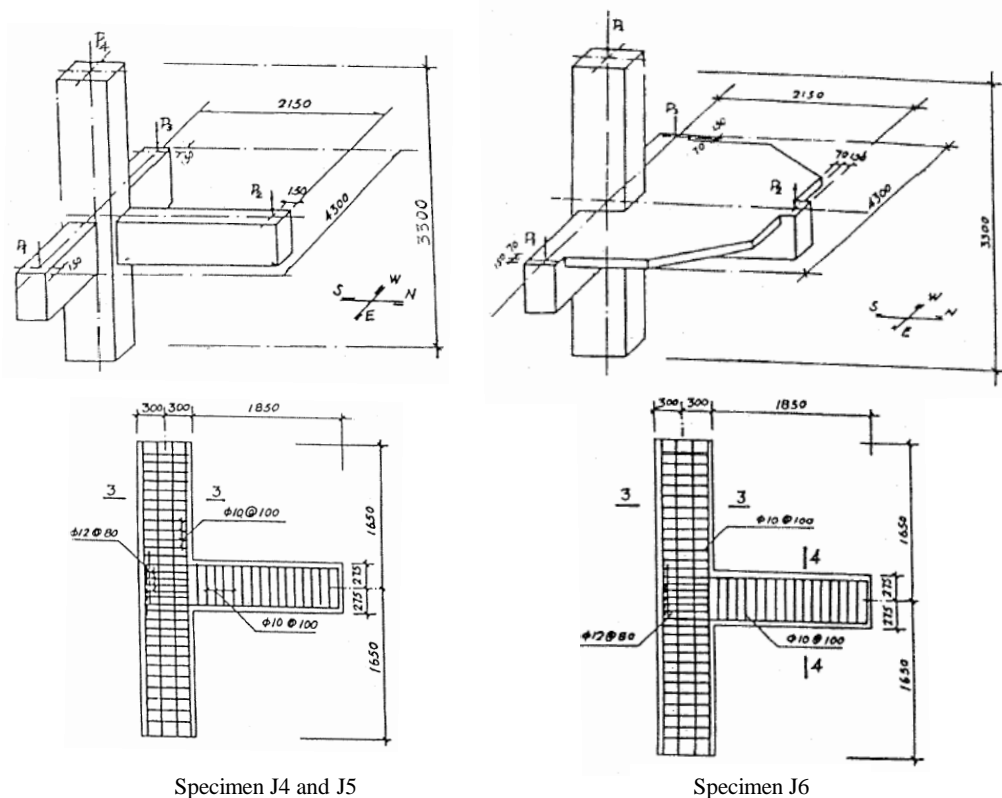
Experimental study by Bolong and Yuzhou [43]: Specimen details
